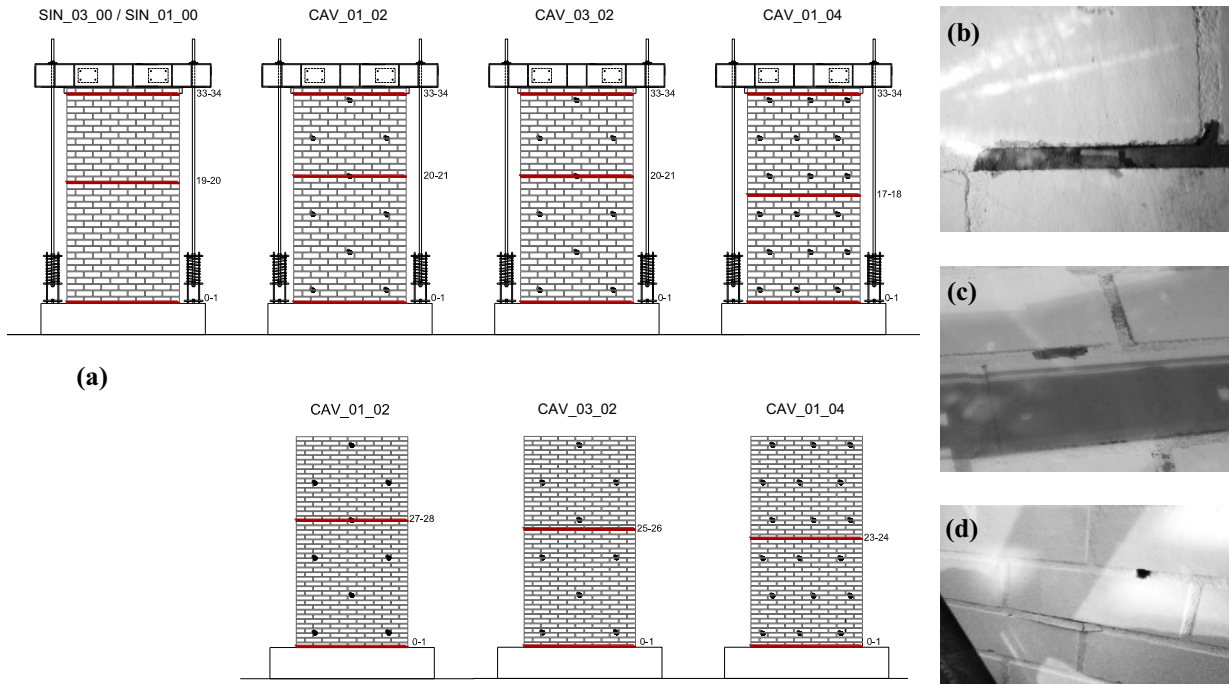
Specimens crack pattern (top CS wall, bottom clay wall) (a) and pictures of damage detected on the CS wall for the CAV-01-02 (b), CAV-03-02 (c) and CAV-01-04 (d).
